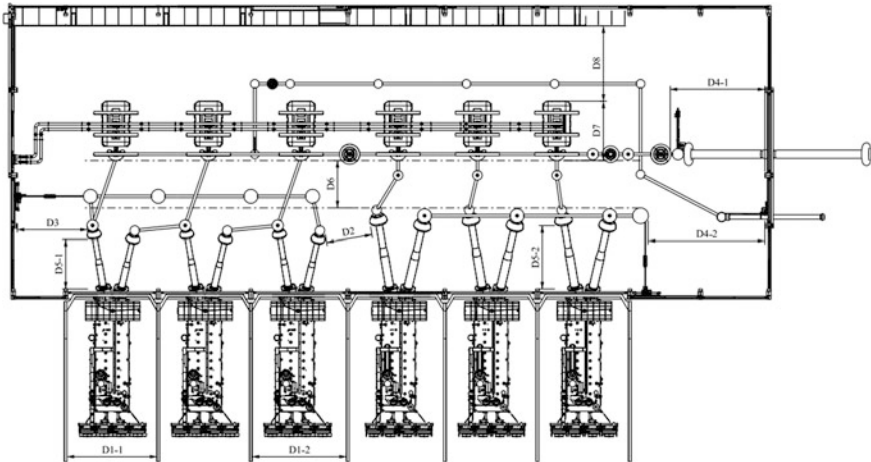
Key dimensions which decide the length and width of valve hall
